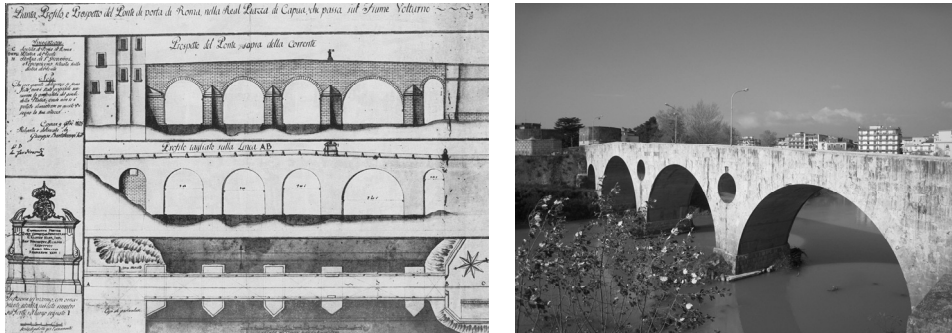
(left): Capua, the ‘Roman bridge’. Plan, longitudinal section and elevation (G. Bartolomaji, 1805) (Istituto Storico di Cultura dell’Arma del Genio, Rome).
